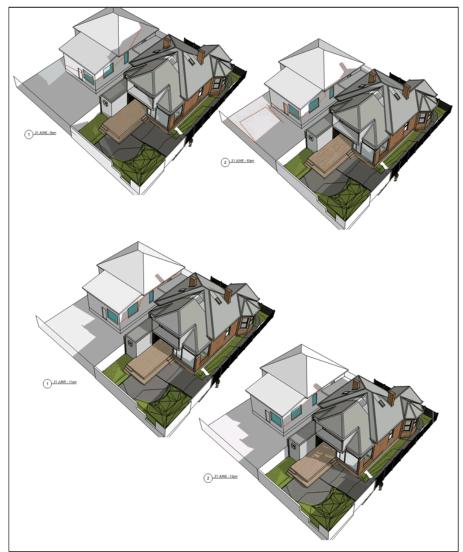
Projected overshadowing caused by proposed alterations and extensions 9:00AM - 12:00PM on June 21st (existing overshadowing outlined in red.
